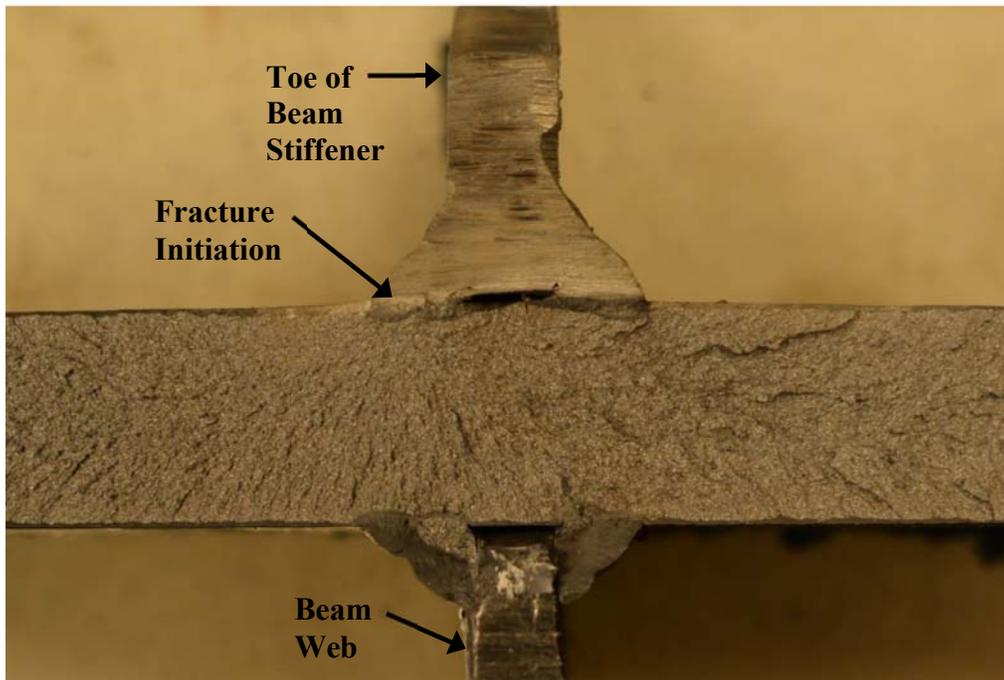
View of Fracture from Outside of Flange
